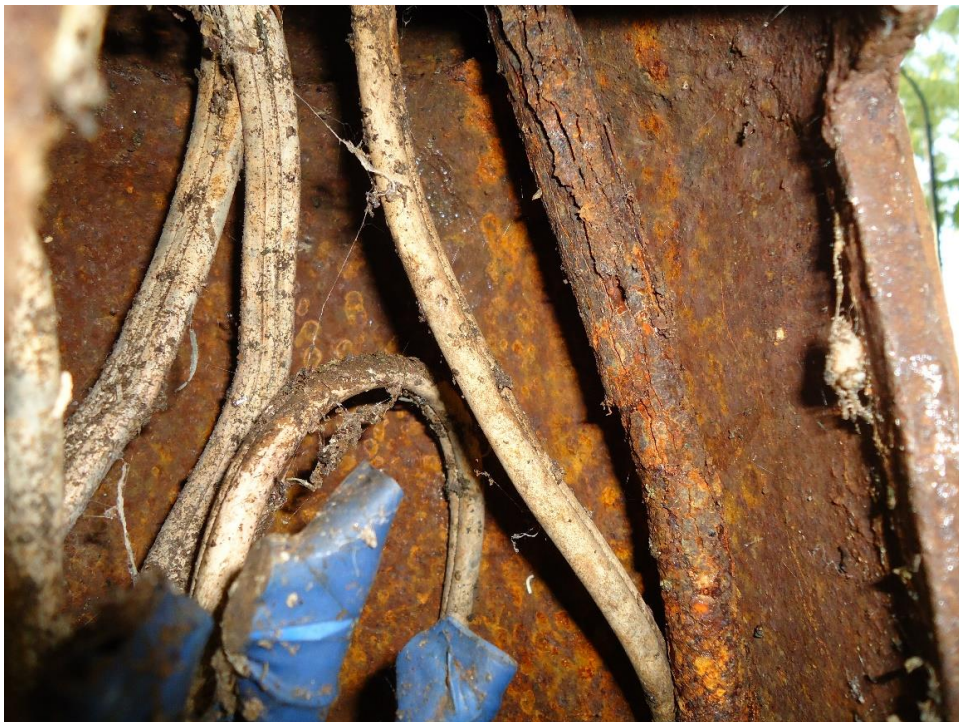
Corroded anchors from Machattie Park and Kings Parade Lamp Standard
